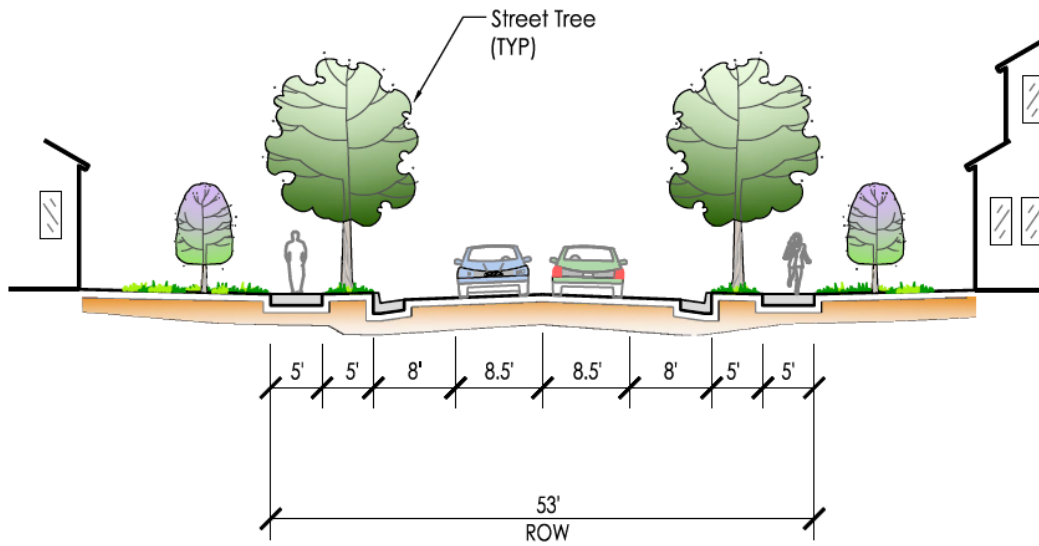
Residential Street w/ Separated Sidewalk (Section J)
